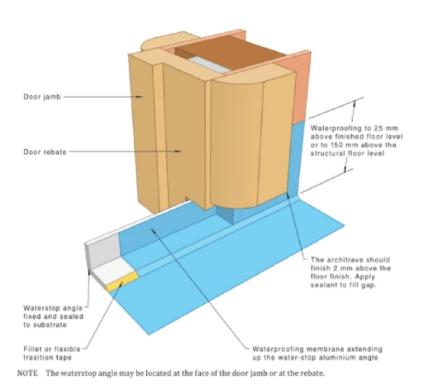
(A) — Example of liquid waterproofing at door opening framework
